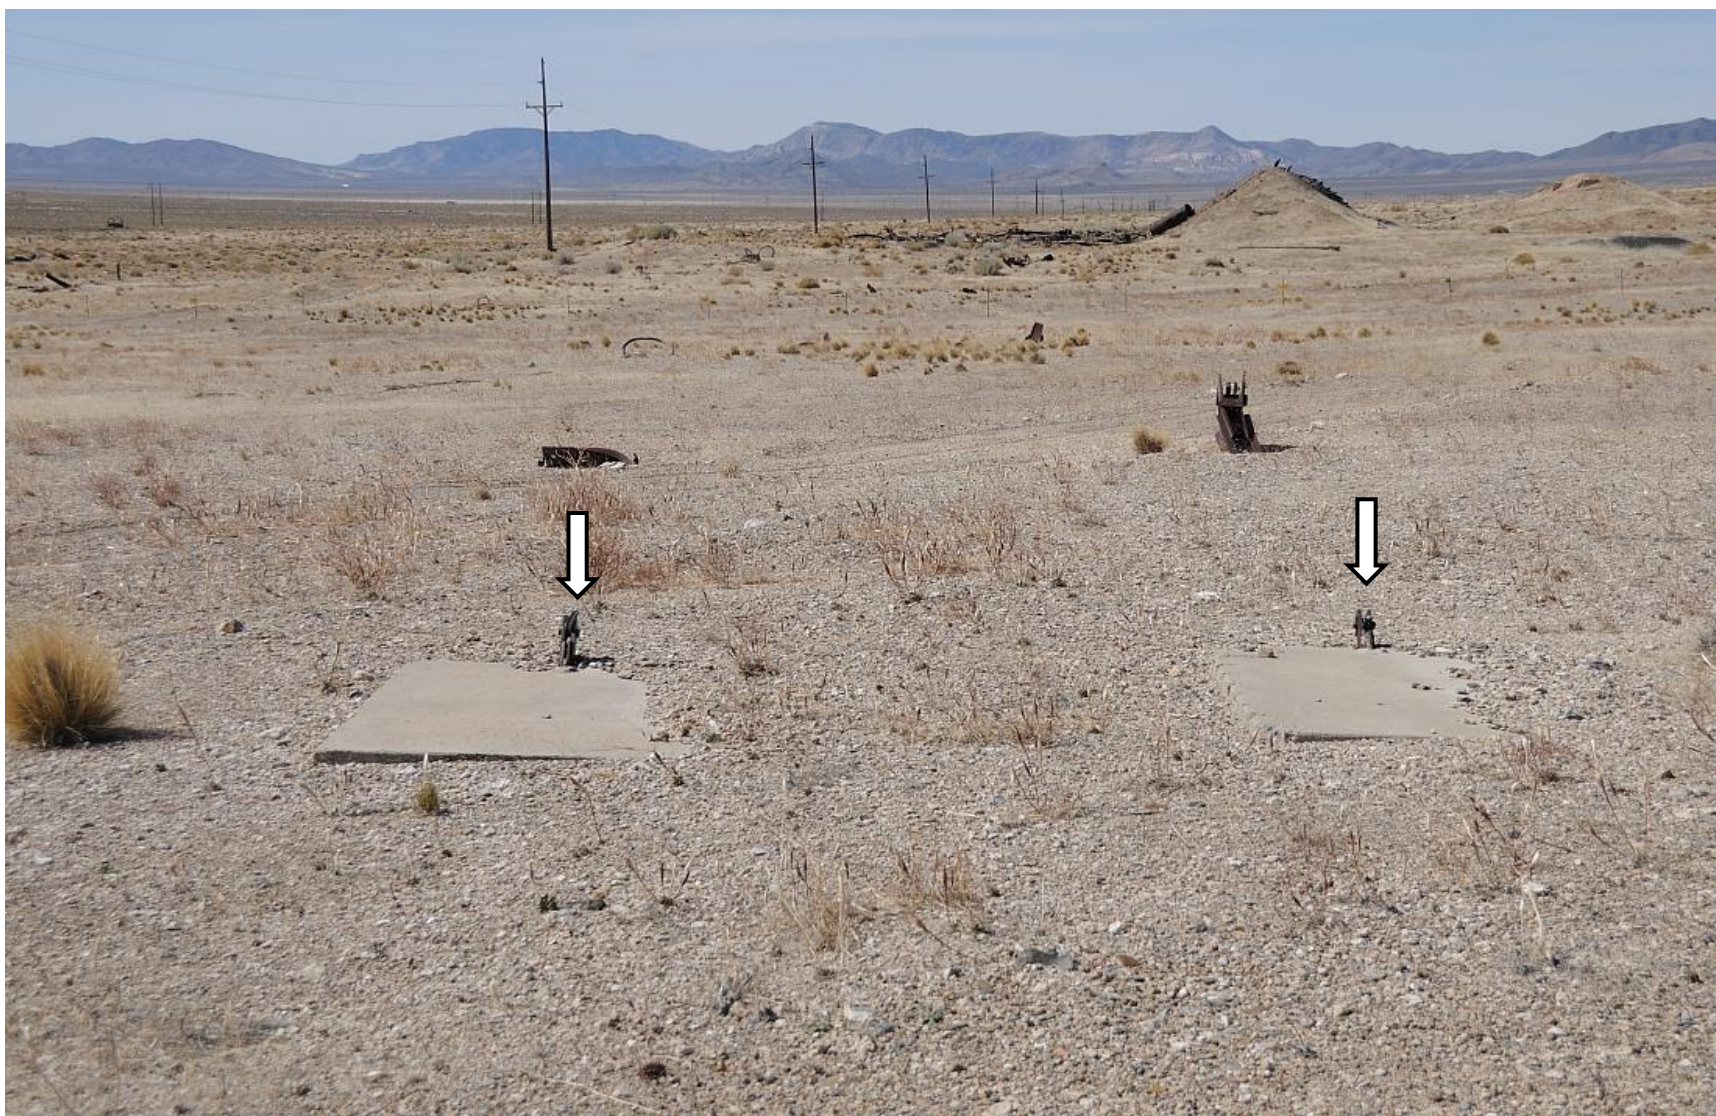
S899, concrete anchor pads and stanchions for instrumentation cable systems 2 and 4 (at arrows), view southwest (2012).
